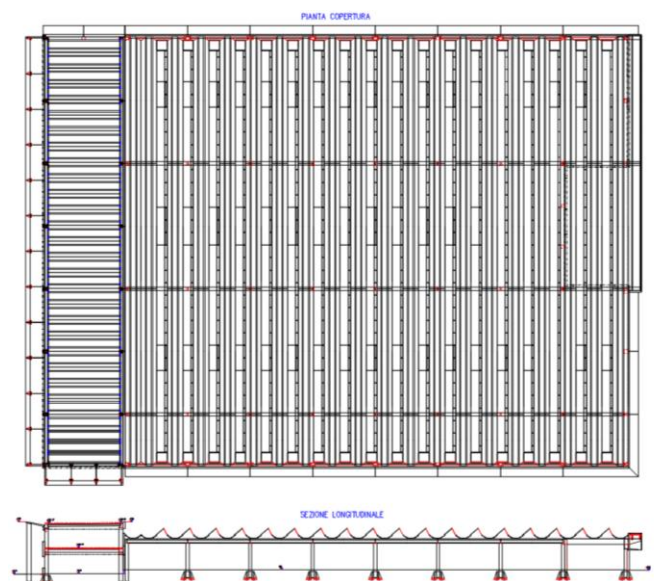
Roof plan and longitudinal section. / Pianta copertura e sezione longitudinale.
